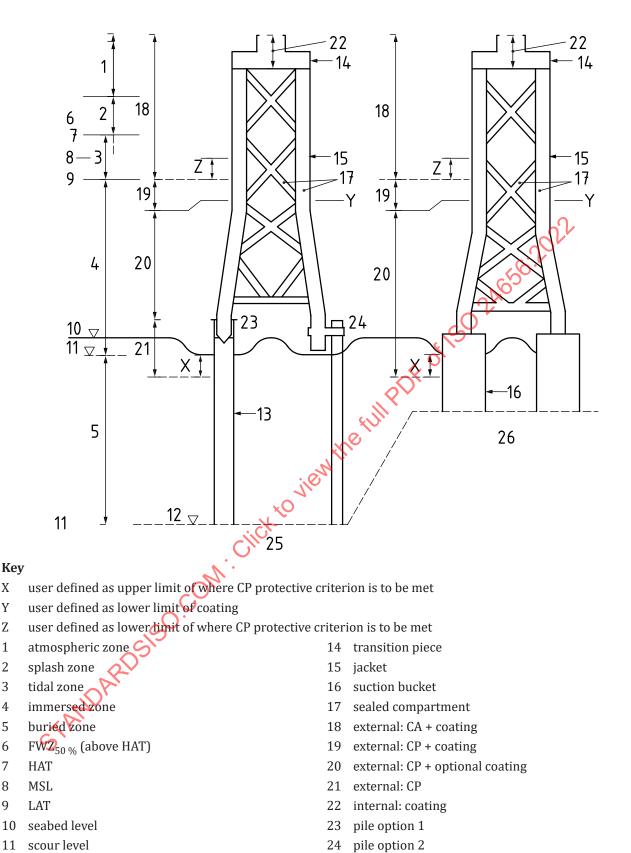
Corrosion protection strategy for piled jacket or suction bucket jacket foundation
